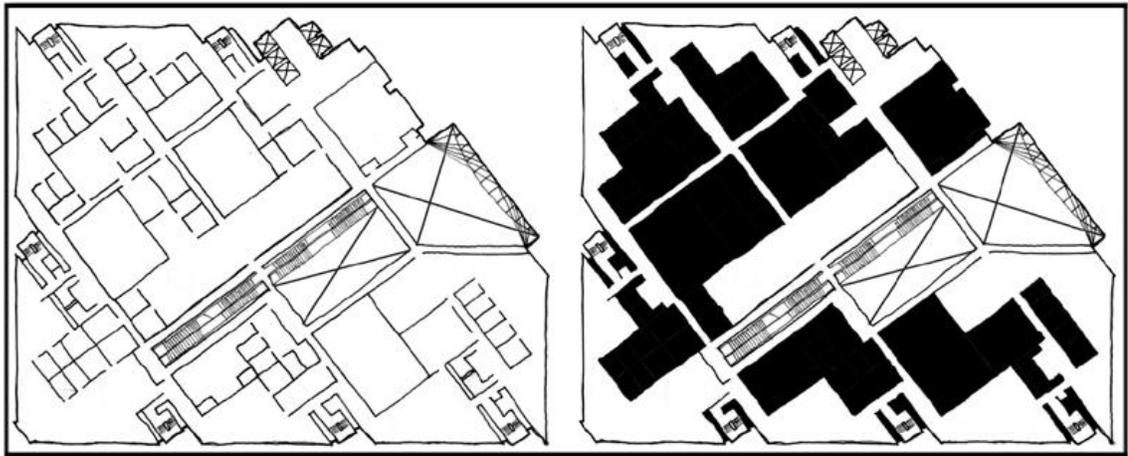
Plan of Typical Office Floor with Diagram showing offices in black and open space and circulation areas in white
